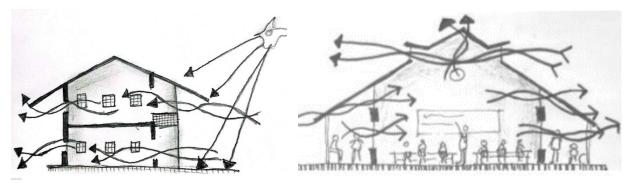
SECTION OF TYPICAL VILLAGE HOUSE
